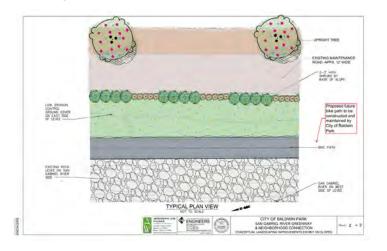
Typical Plan view of SGR/Walnut Creek Bikeway project
